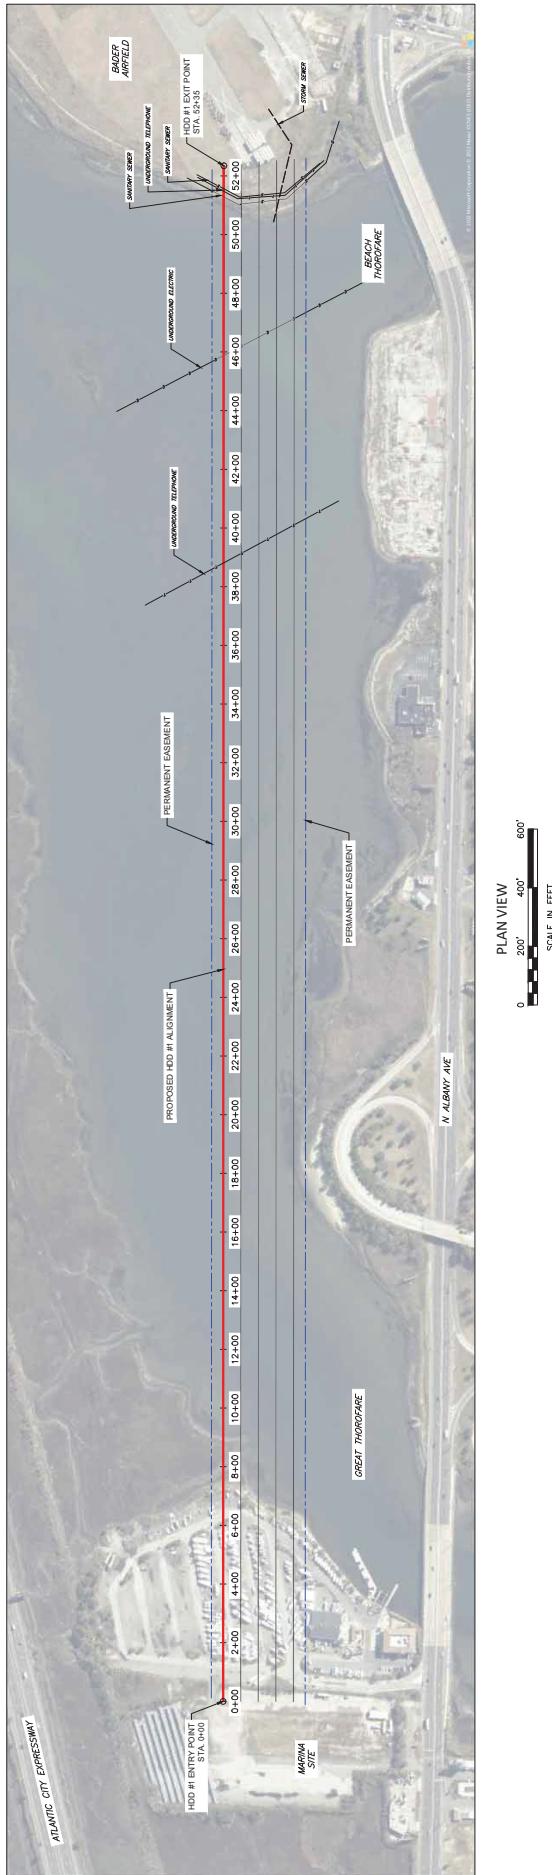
Great Thorofare Crossing #1 HDD Plan and Profile
